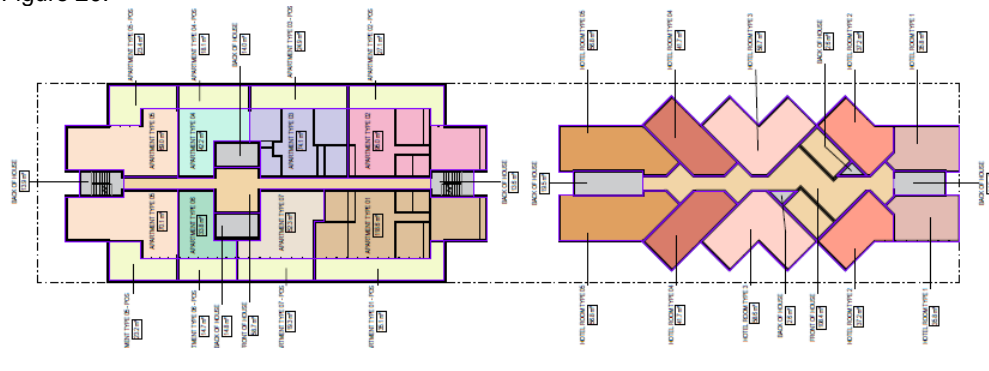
Typical floor plan of tower structures, serviced apartments (left) and hotel (right)
